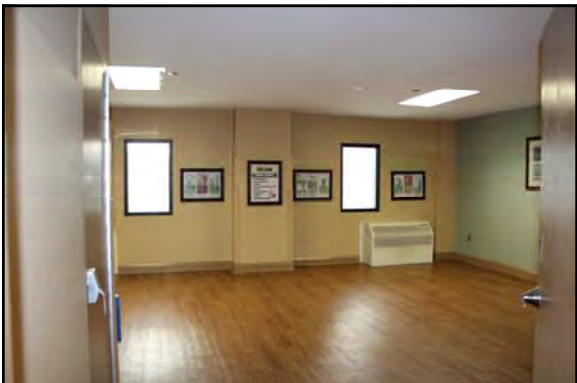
## PHOTOS - MAIN BUILDING "2ND FLOOR"
